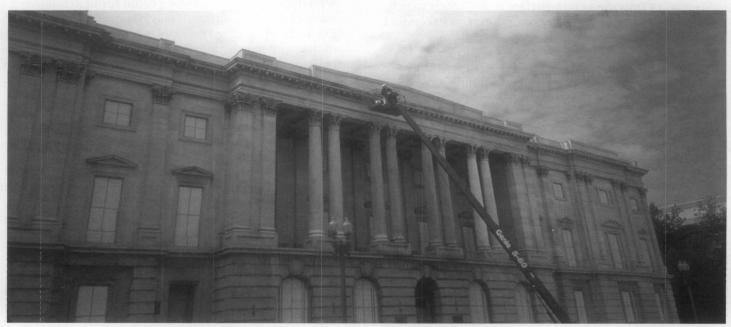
Low-to medium-pressure steam (hot-pressurized water washing), is being used to clean the exterior of the U.S. Tariff Commission Building, the first marble building constructed in Washington, D.C., in 1839. This method was selected by an architecural conservator as the "gentlest means possible" to clean the marble. Steam can soften heavy soiling deposits such as those on the cornice and column capitals, and facilitate easy removal. Note how these deposits have been removed from the right side of the cornice which has already been cleaned. 332
